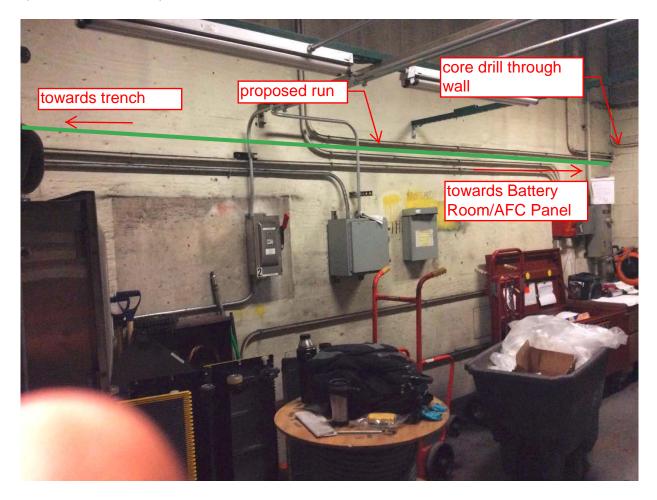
A05 Cleveland Park: Battery Room #218, proposed conduit routed along right side wall at ceiling
